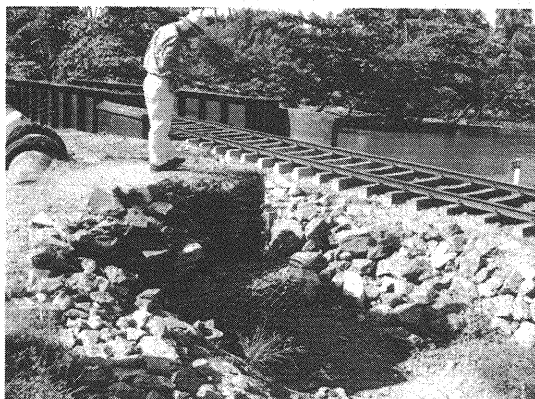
Railway bridge where abutment installation has been damaged
